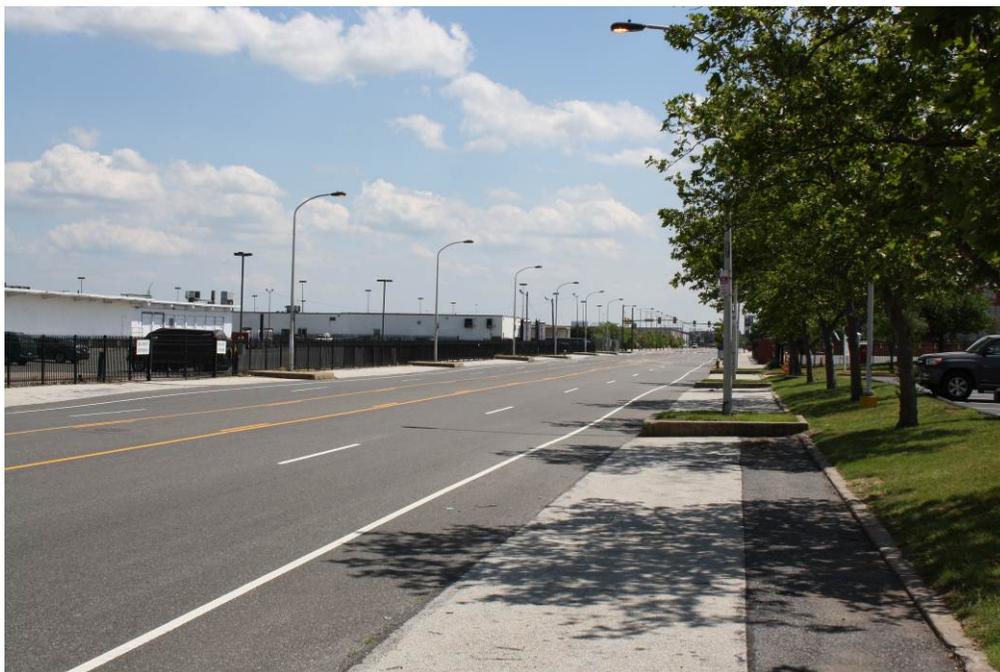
Pull-Outs on S. Darien Street Along Site Frontage
